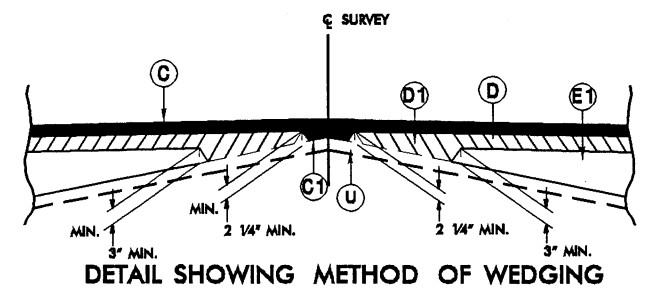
DETAIL FOR WEARING SURFACE ON CORED SLAB BRIDGE
